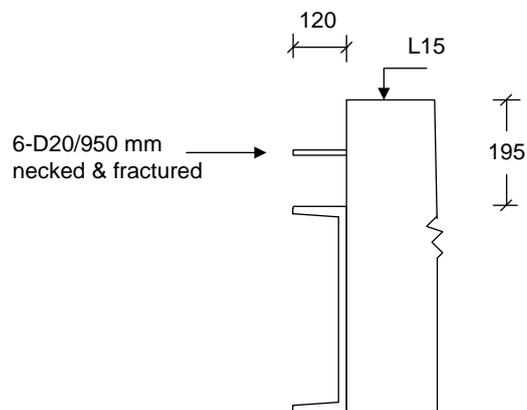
Southwest L15 to L14 stair upper landing with fractured D20 reinforcing steel above 381x102 mm RSC steel channel support
